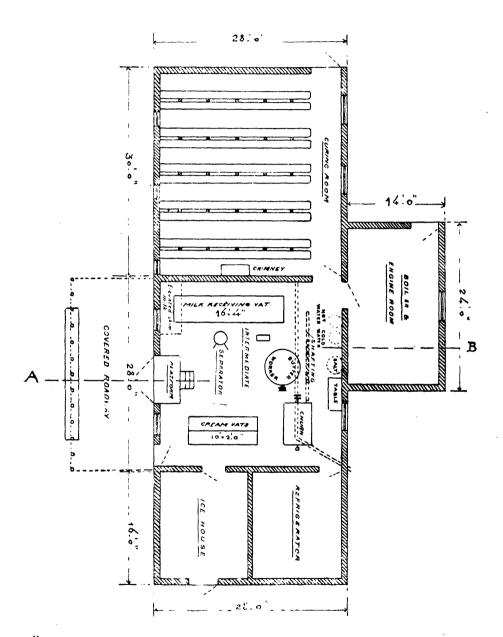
FIGURE II.—Showing the ground plan with the apparatus for making butter in place.
